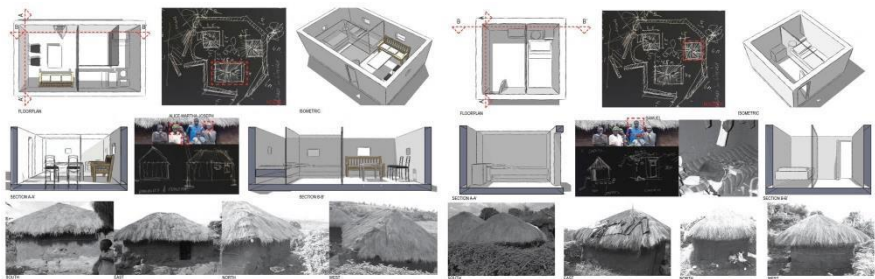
Inventory of the houses: floor plan, sections and facades (*Source: M. Smits*)
